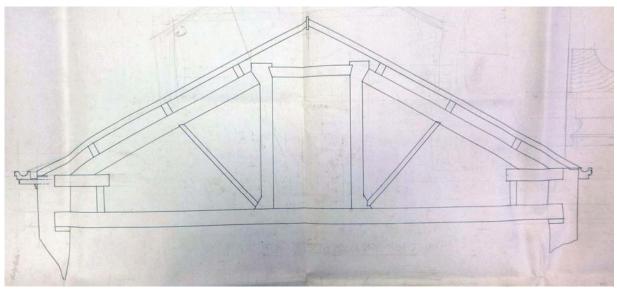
Roof truss, dated c1903 (CAC(B) Z/1028/1 c1903)
